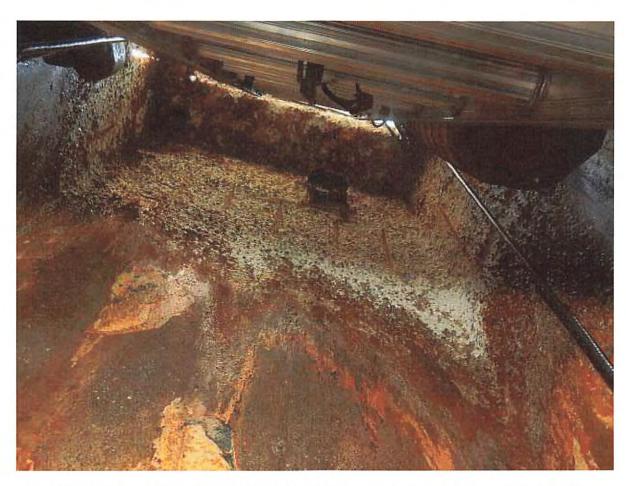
View of the upper portion of the wet well (primarily the north wall) showing loss of concrete cover and exposure of vertical reinforcement. Loss of concrete cover is also visible on the underside of the top slab.
